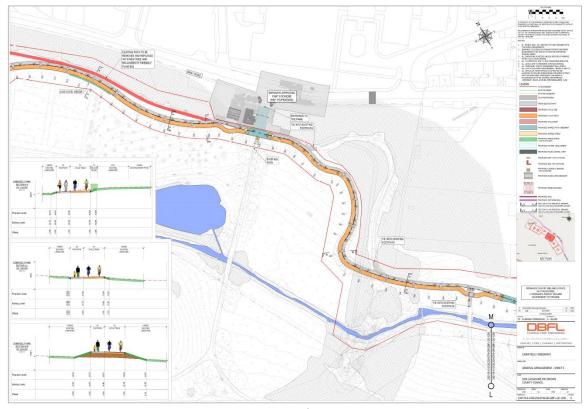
Proposed Route Section C [DBFL Drawing No 230119-X-0100-Z00-DTM-DR-DBFL-CE-1205 General Arrangement - Sheet 5]
